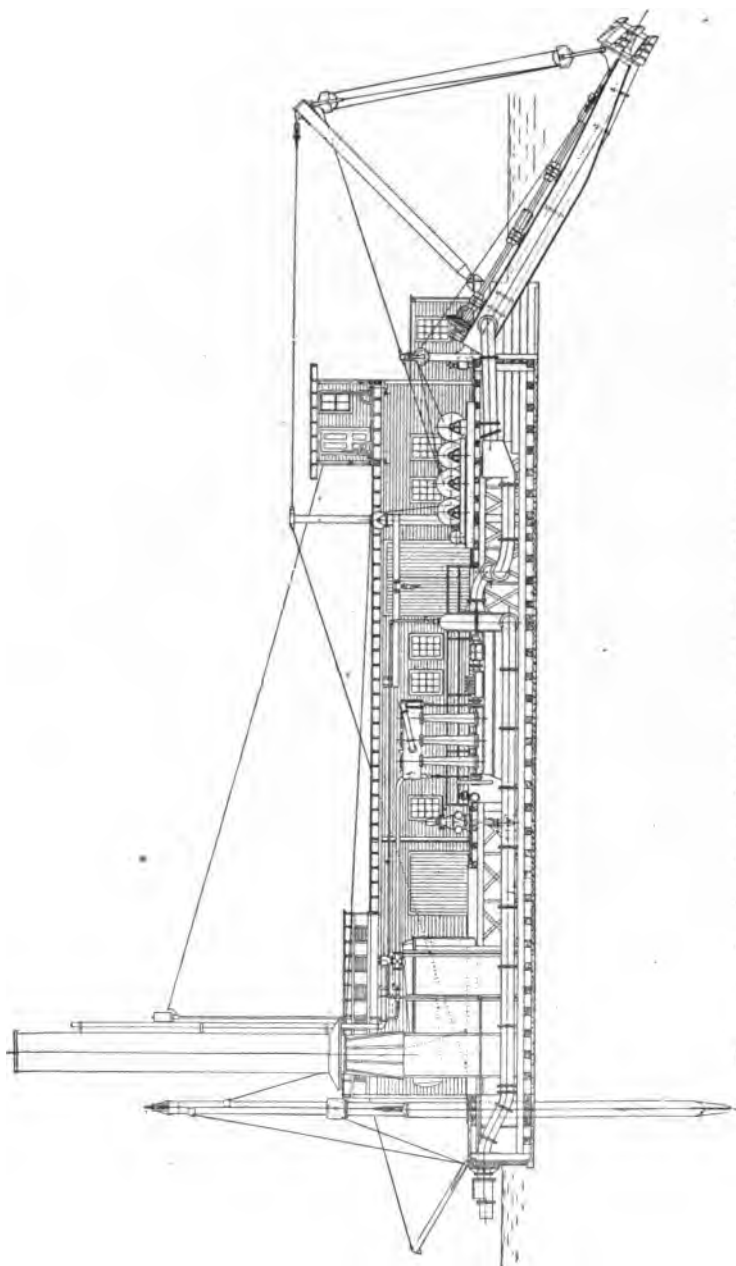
Suction dredge built by the Morris Machine Works, Baldwinville, N. Y.
